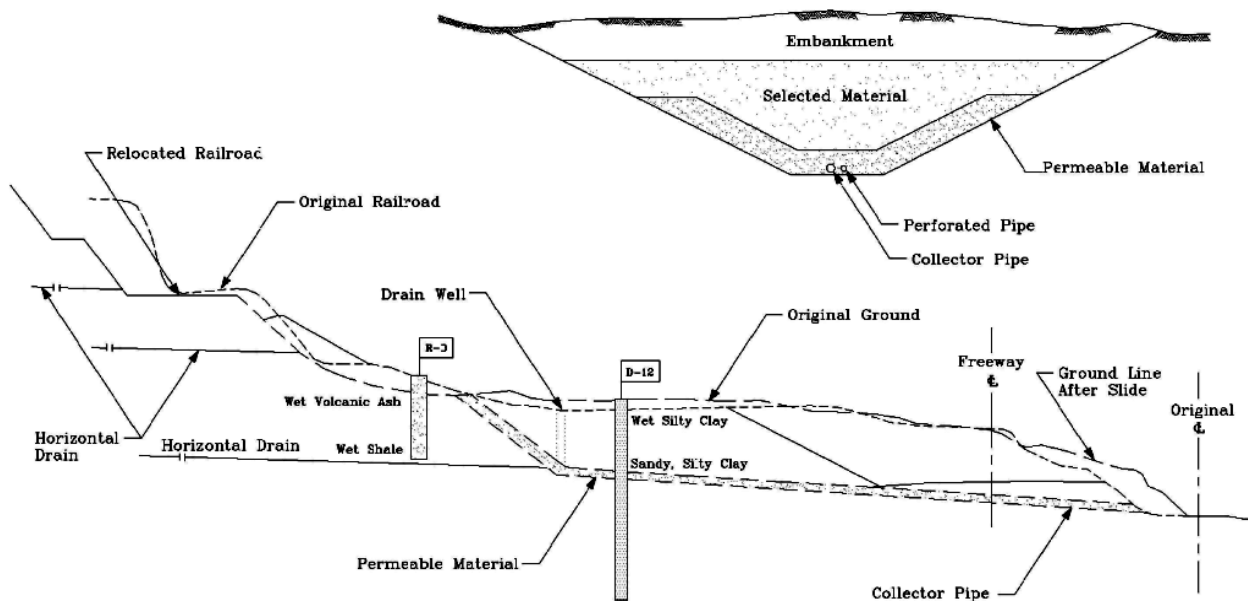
A typical section of drainage trench at Towle slide (redrawn from: Moulton, 1980; Smith and Cedergren, 1963).
